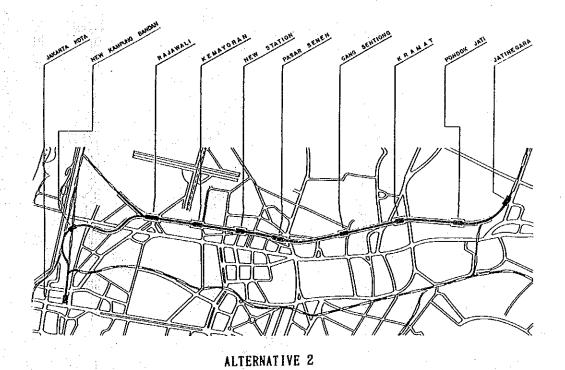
Horizontal Alignment of the Track Elevation
